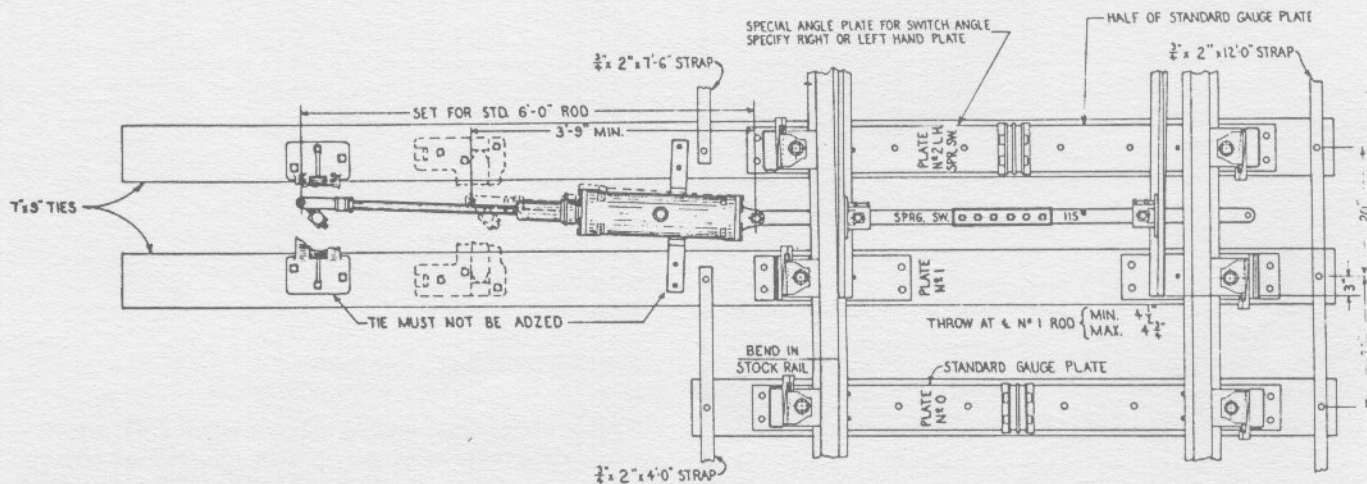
Typical plan of a spring switch layout. Note: Mechanical Switchman is a copyright name for a patented spring switch mechanism manufactured by the Pettibone Corp.
